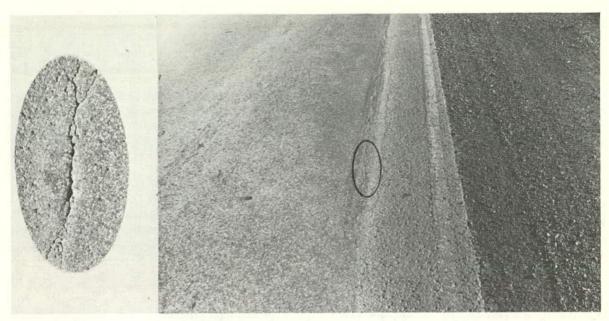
Rutting or settlement and cracking along widening joint caused by poor compaction or inadequate subgrade support.
